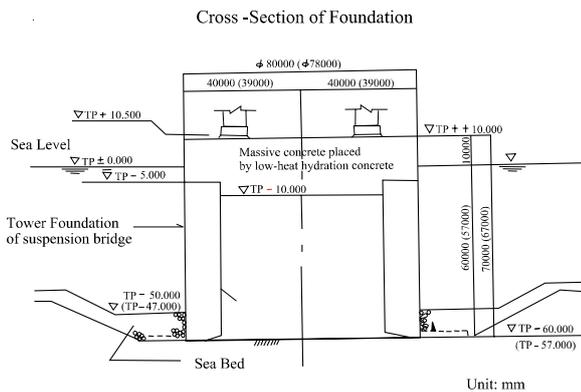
concrete foundation of Akashi-Kaikyou Bridge towers
